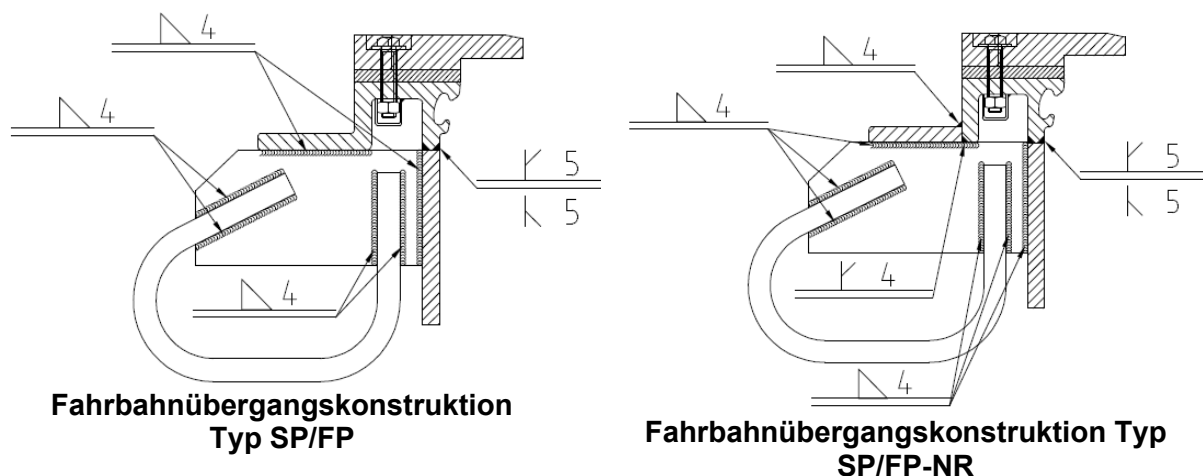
Dimension and type of welds according to EN ISO 2553
